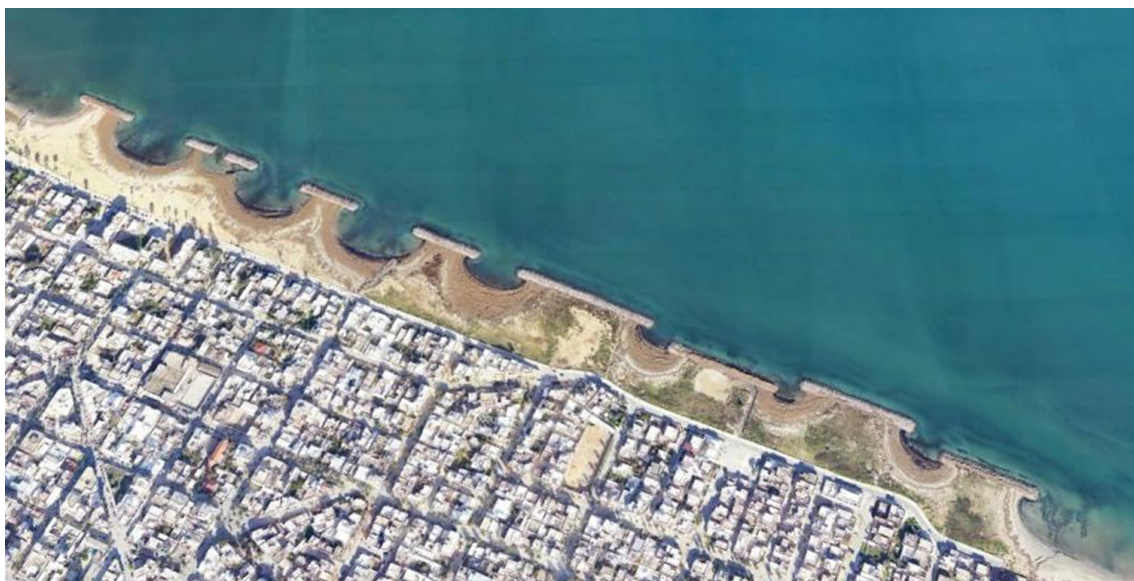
Set of 8 protective breakwaters of Hammam Lif (southern suburb of Tunis)
